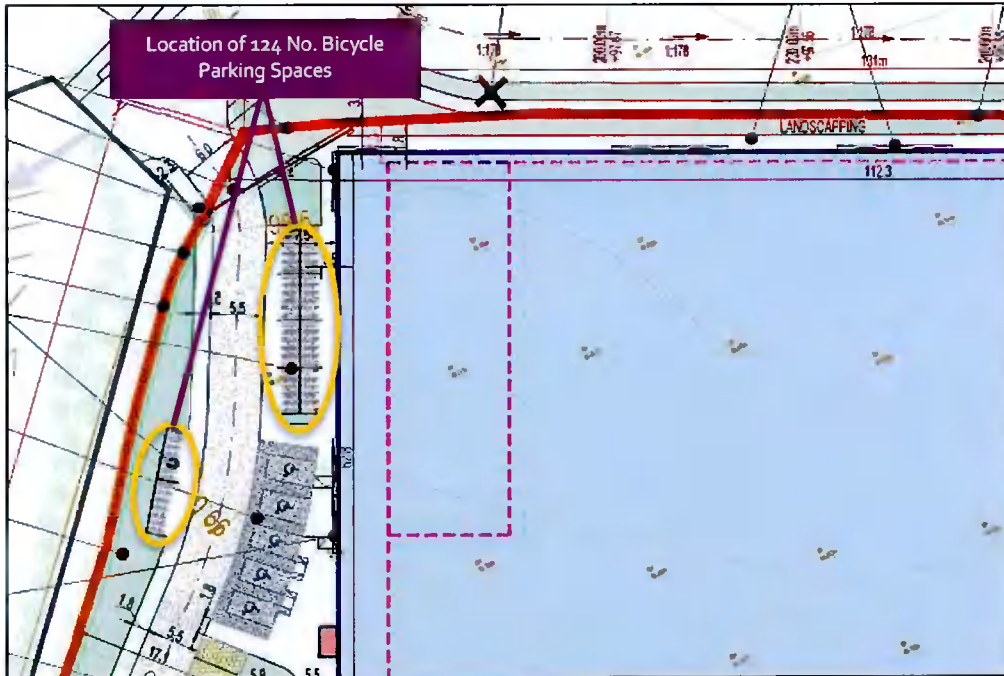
Location of Proposed Bicycle Parking on Site Plan
